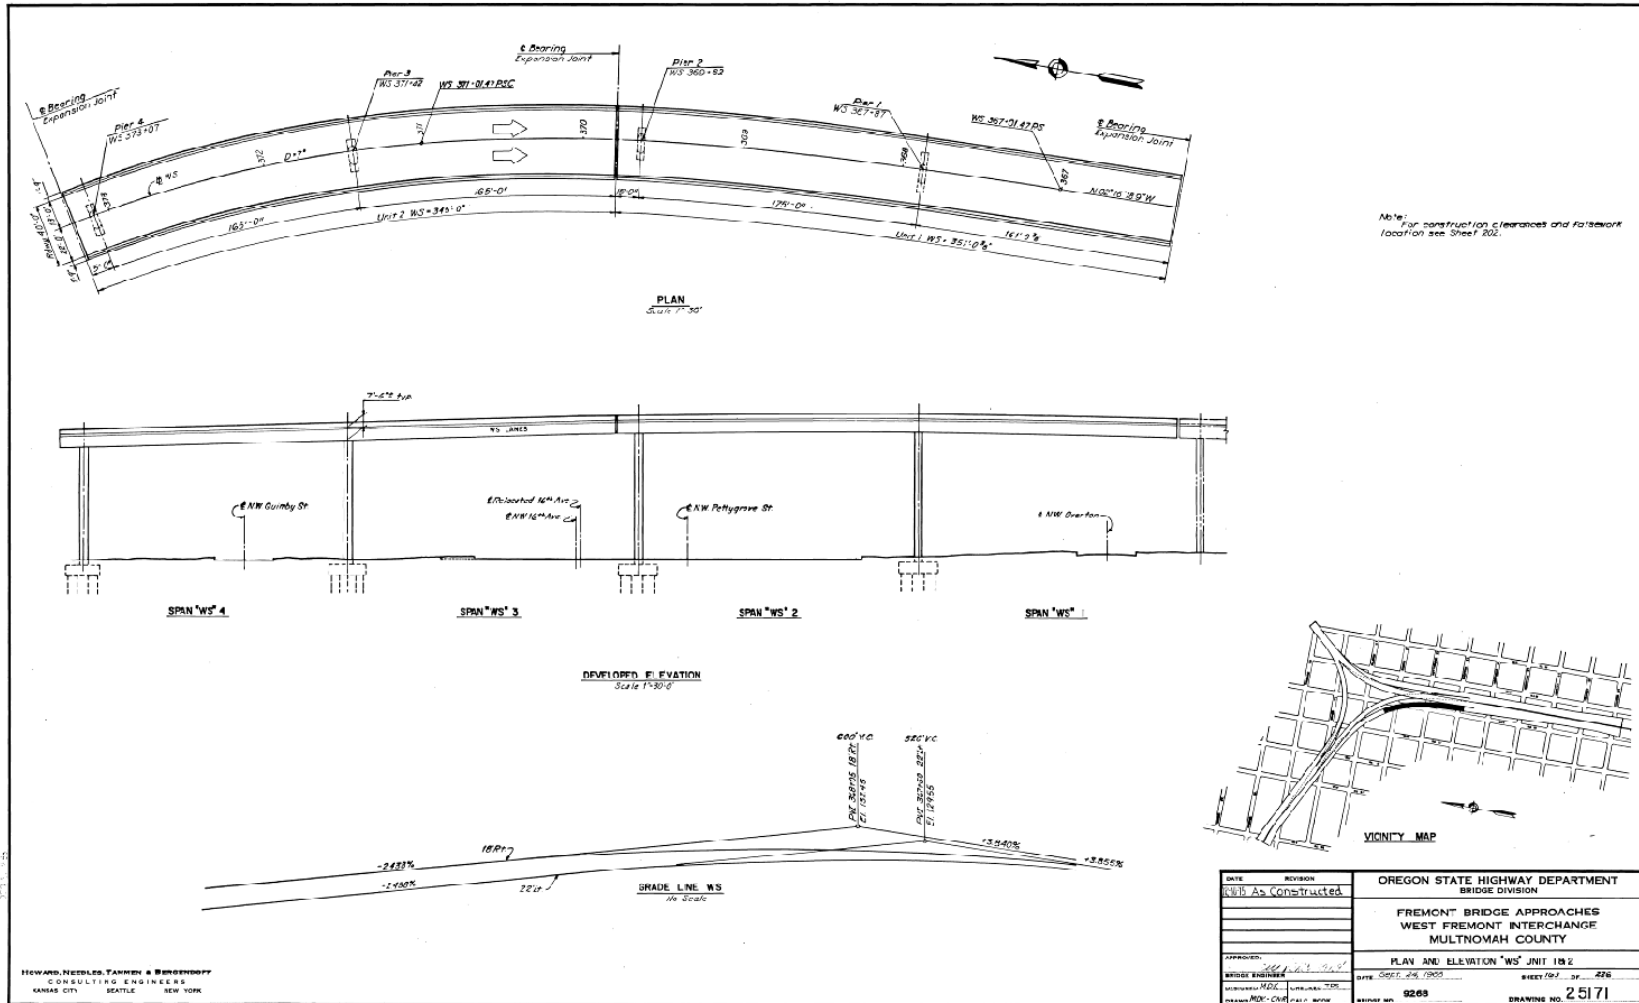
Plan and elevation views of WS Units 1 and 2 Bridge superstructure 09268B.
